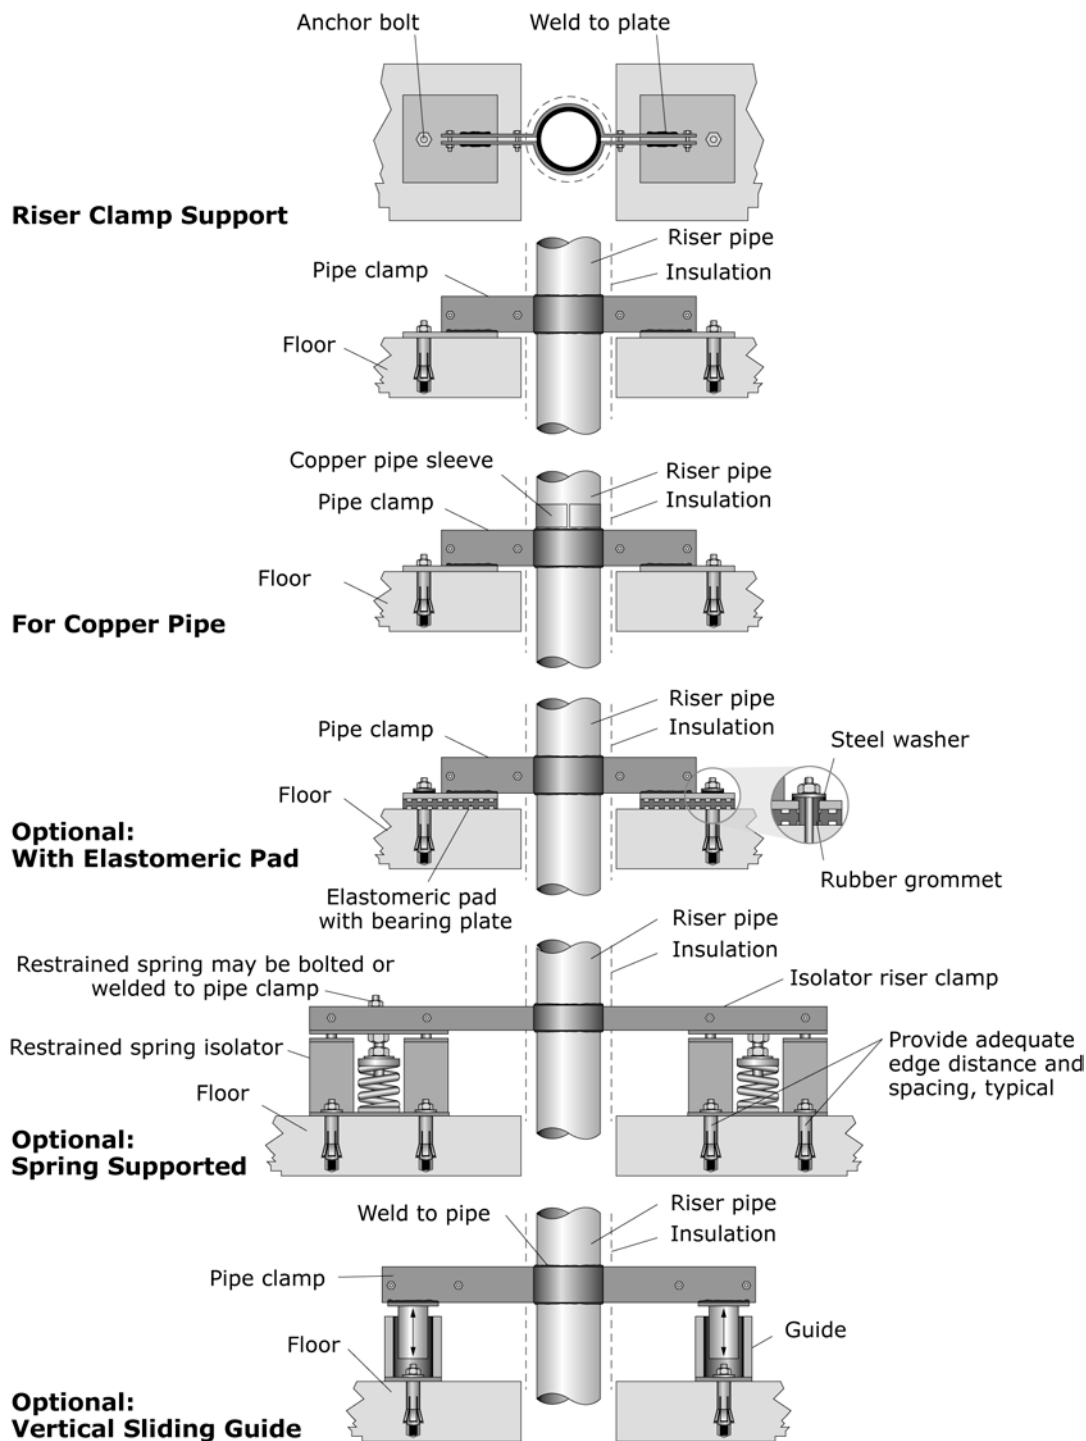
Riser restraint/support at floor penetrations – variations with pipe clamp, vibration isolation, and sliding guides (ER).
